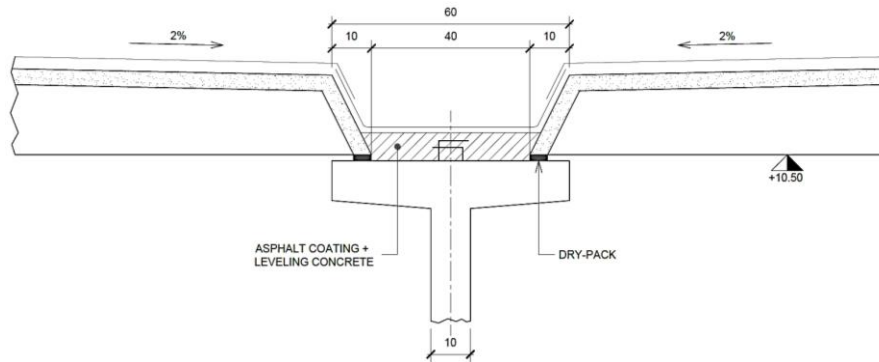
Support scheme for the slabs on the beams (units in cm).
